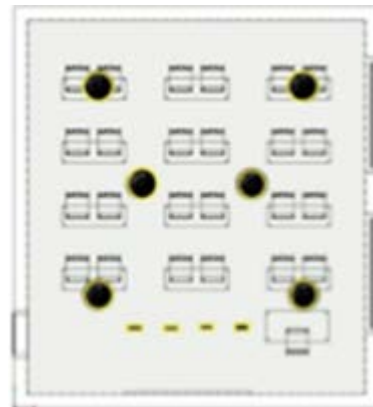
Lighting Fixtures in the classroom floor plan (Dialux)
